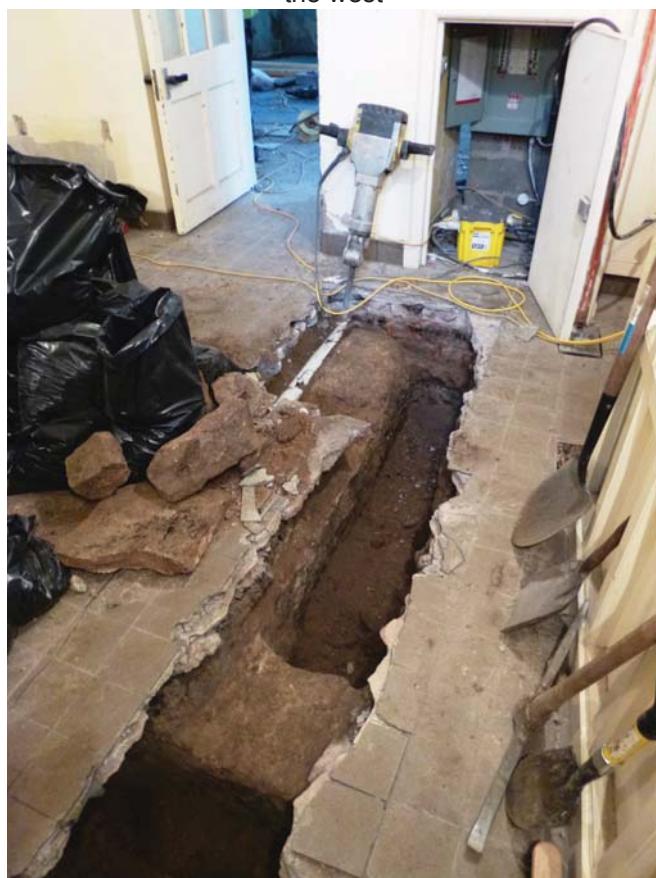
Cannonball House, lower ground floor, detail of the service trench exposing Wall [001] (to the foreground) and Wall [002] (running perpendicular to it from Wall [001], from the south)
